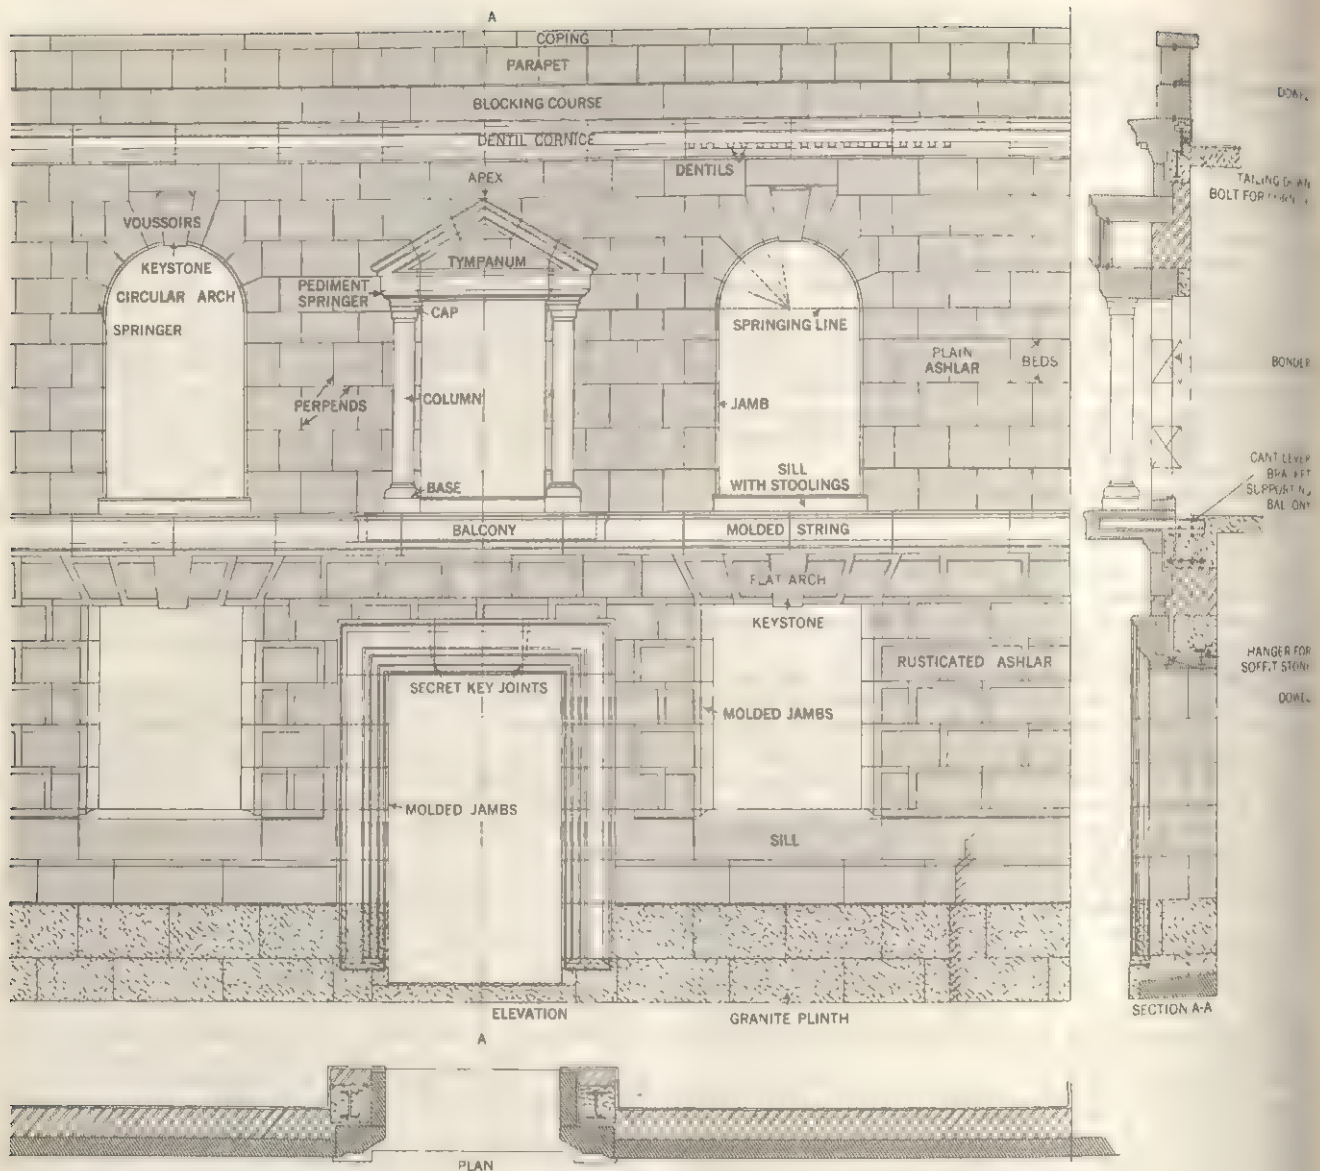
ARCHITECTURAL TERMS ILLUSTRATED IN ELEVATION, SECTION AND PLAN
